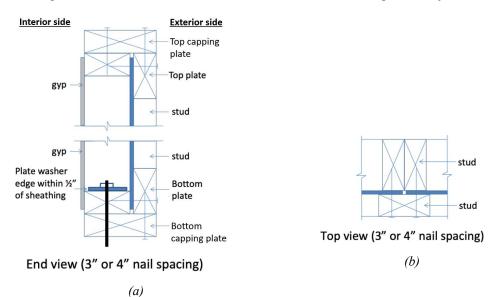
New framing arrangement for Midply: a) vertical cross-section, b) cross-section of studs where panels butt together.
